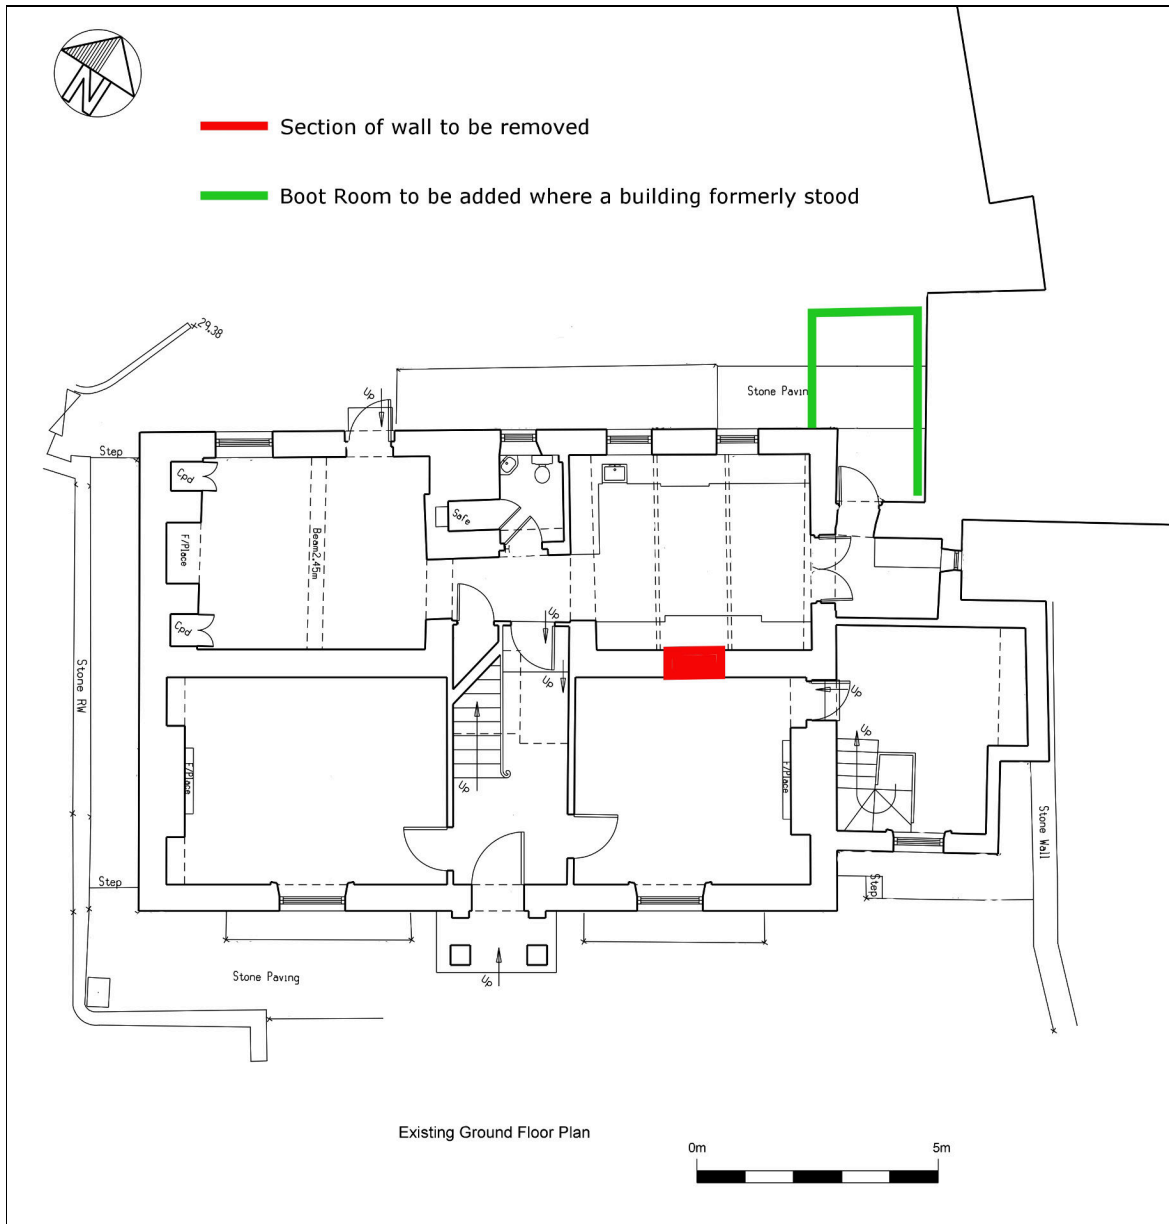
The changes which will impact on the listed building at Kingscombe, based on client plan from RFP Architects Ltd, Factory House, Factory Road, Cowbridge, CF71 7JD, Drawing number 2337/DP200.
